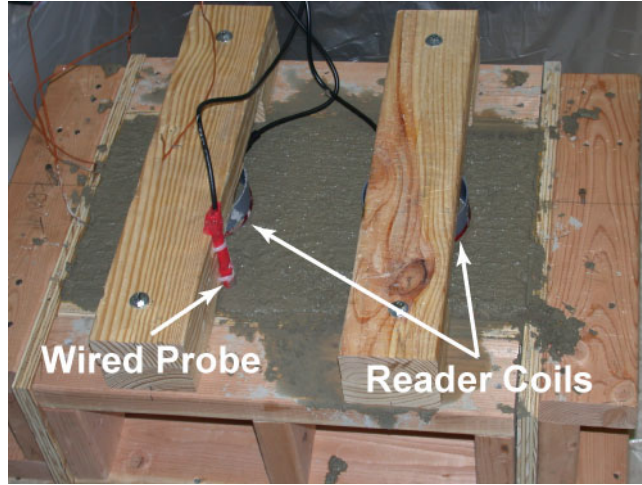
Final arrangement of reader coils and wireless probe after casting concrete.
